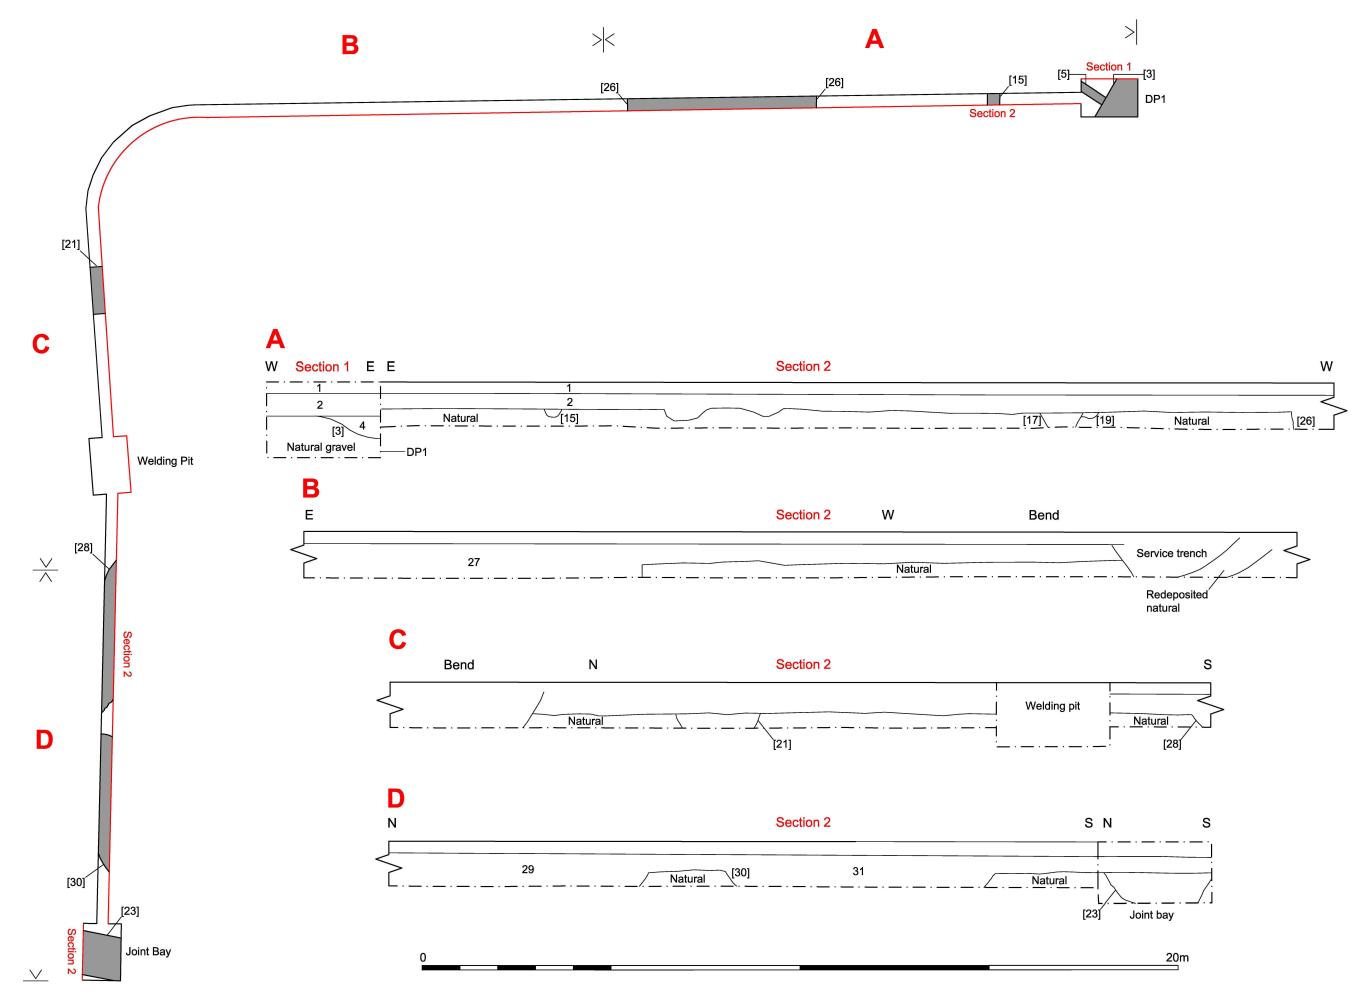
Plan of open cut trench and sections 1 and 2. Scale 1:200 and 1:100
